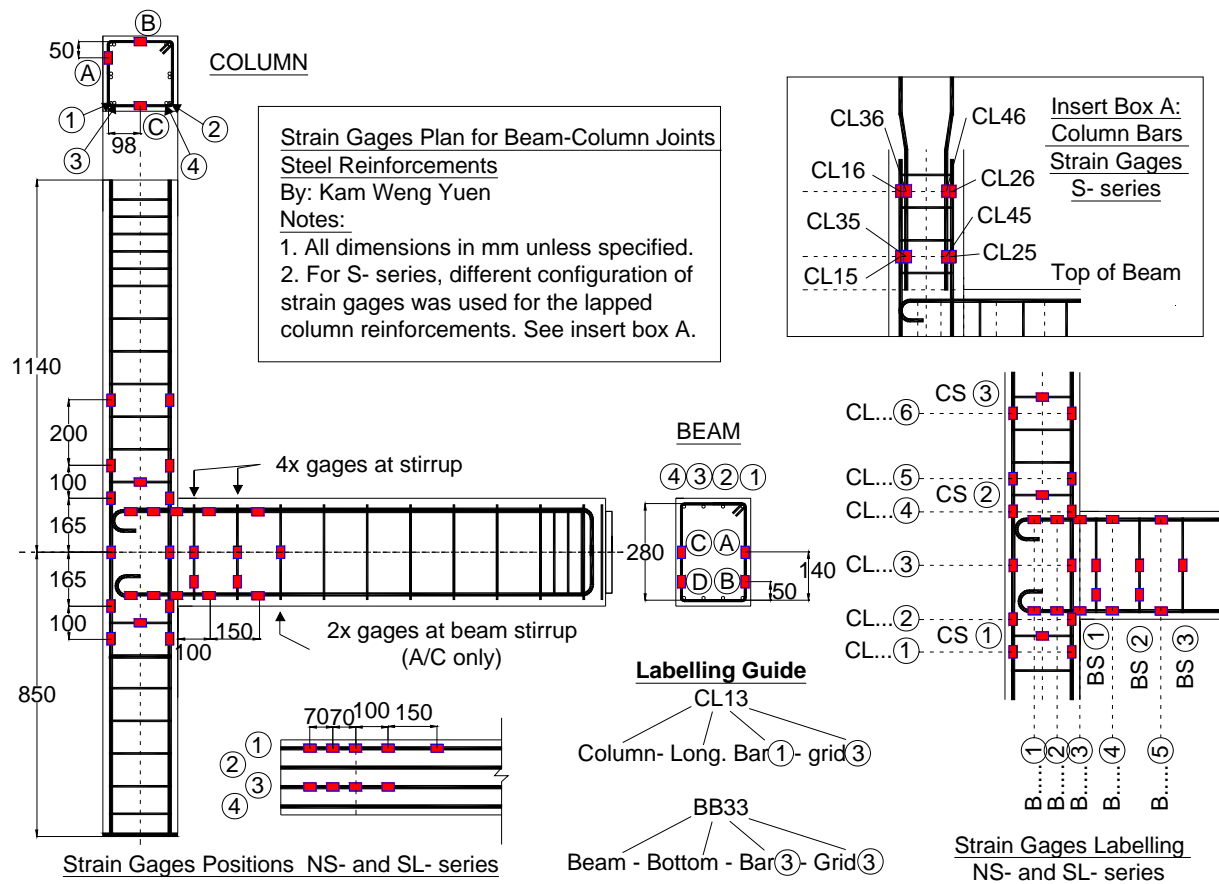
Strain gages plan and labelling guide for all beam-column joint test units.
